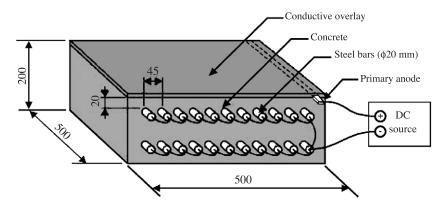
Reinforced concrete specimens used for CP tests (dimensions are in mm).
